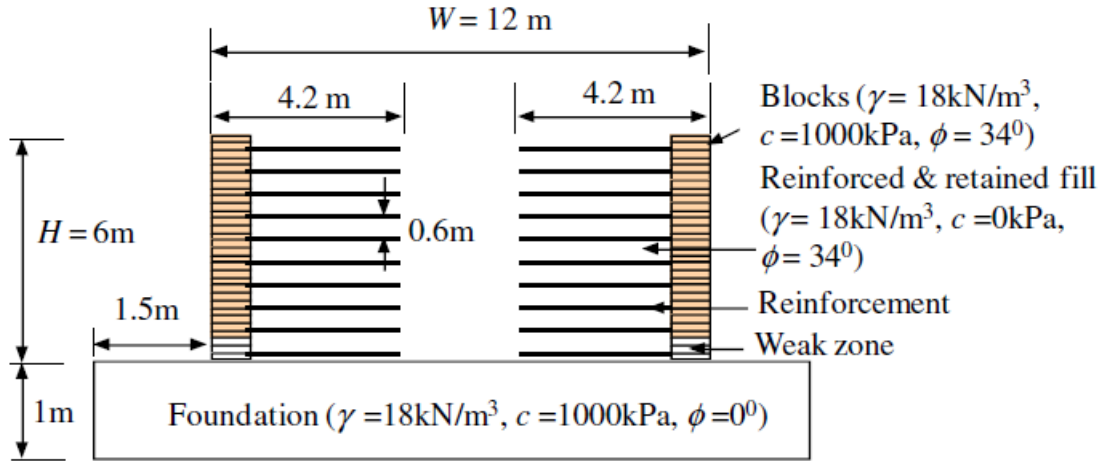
Model of Back-to-Back Reinforced Retaining wall (Han and Leshchinsky, 2007)
